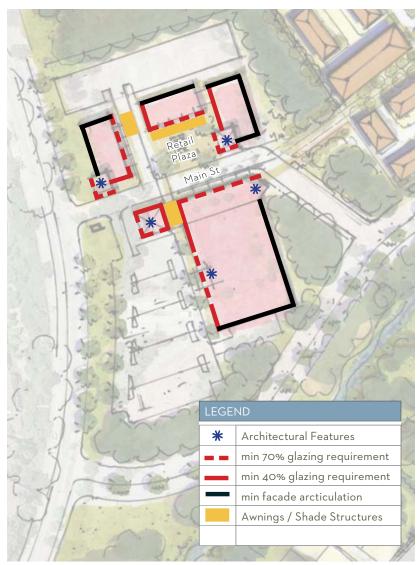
Facade Treatments, Architectural Elements, Example of Conceptual Layout, this example plan intended to show compliance with the design objectives of a 'Main St' and 'Plaza', actual site and building configuration may vary.
